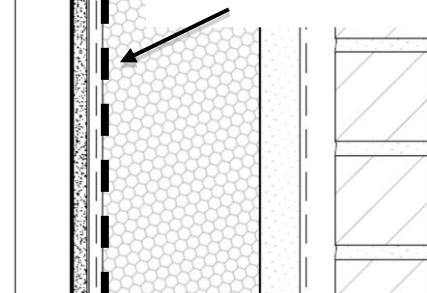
Condensation Plane for Walls with Spray Foam Insulation (Source: Twiddy, 2011)
